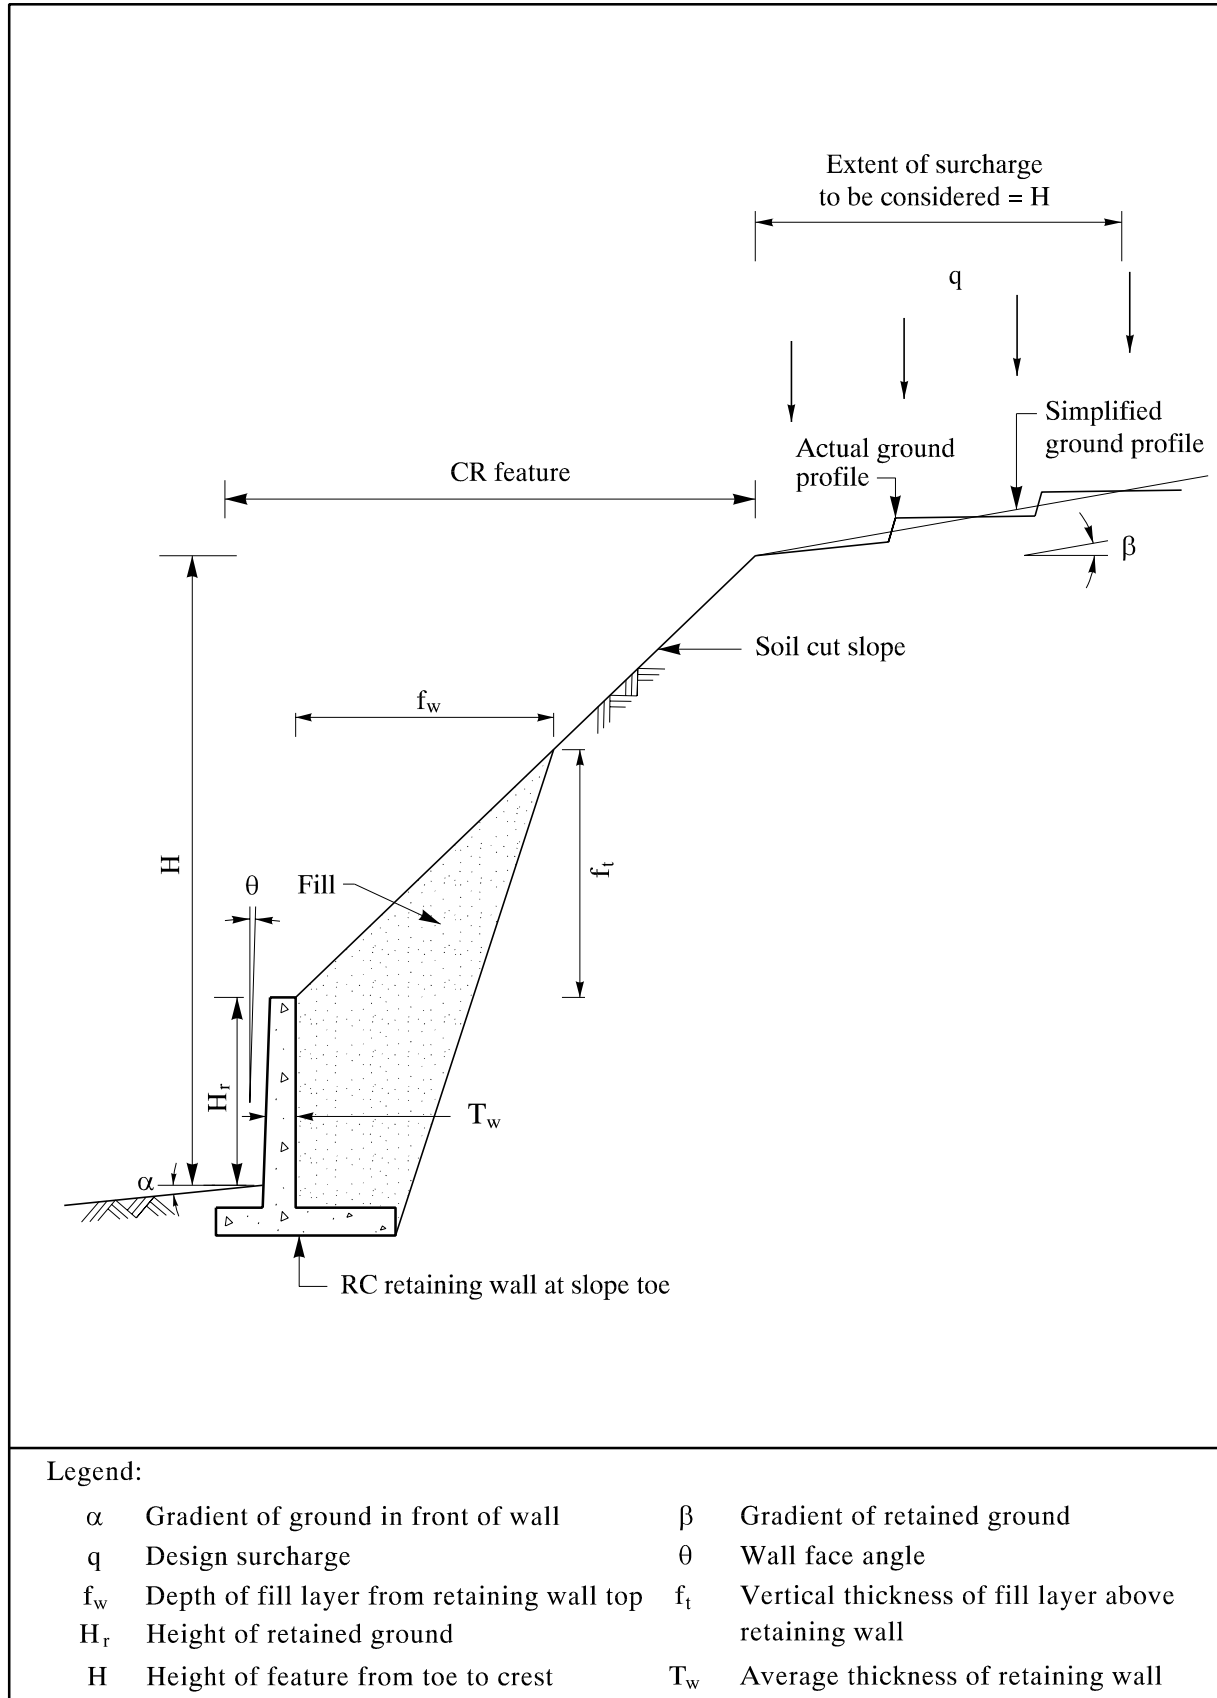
Simplified Geometry of CR Feature with a RC Retaining Wall and the Adjacent Ground
